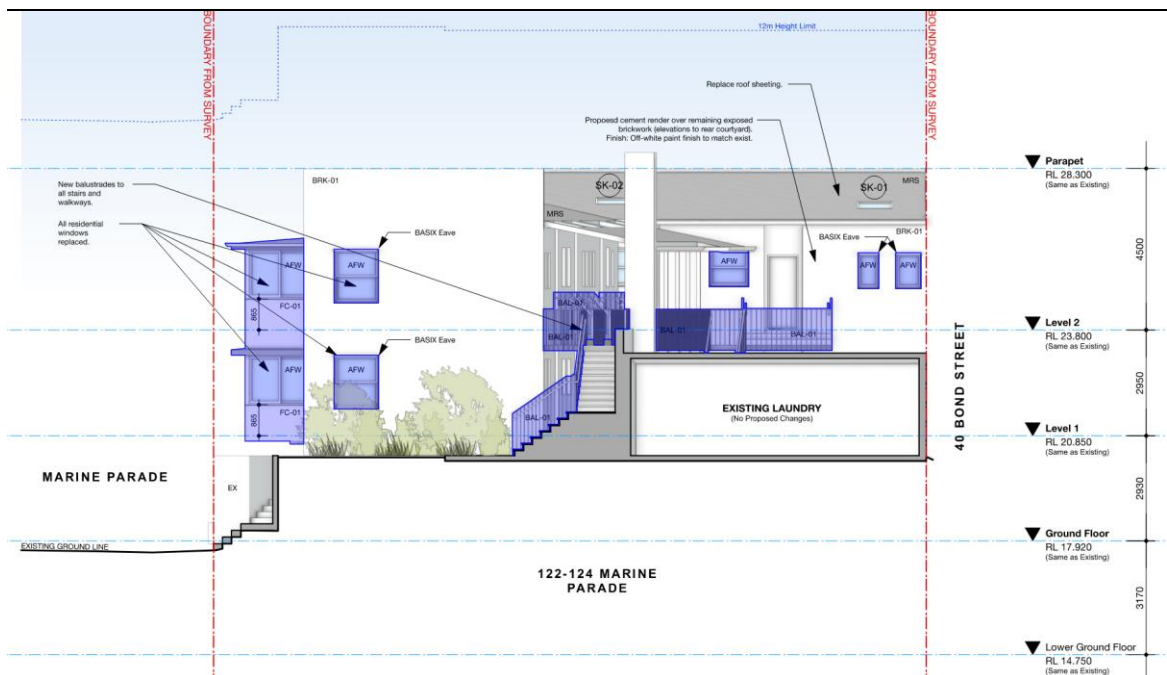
Proposed North Elevation (Source: Hill Thalys – 05/12/2025)
